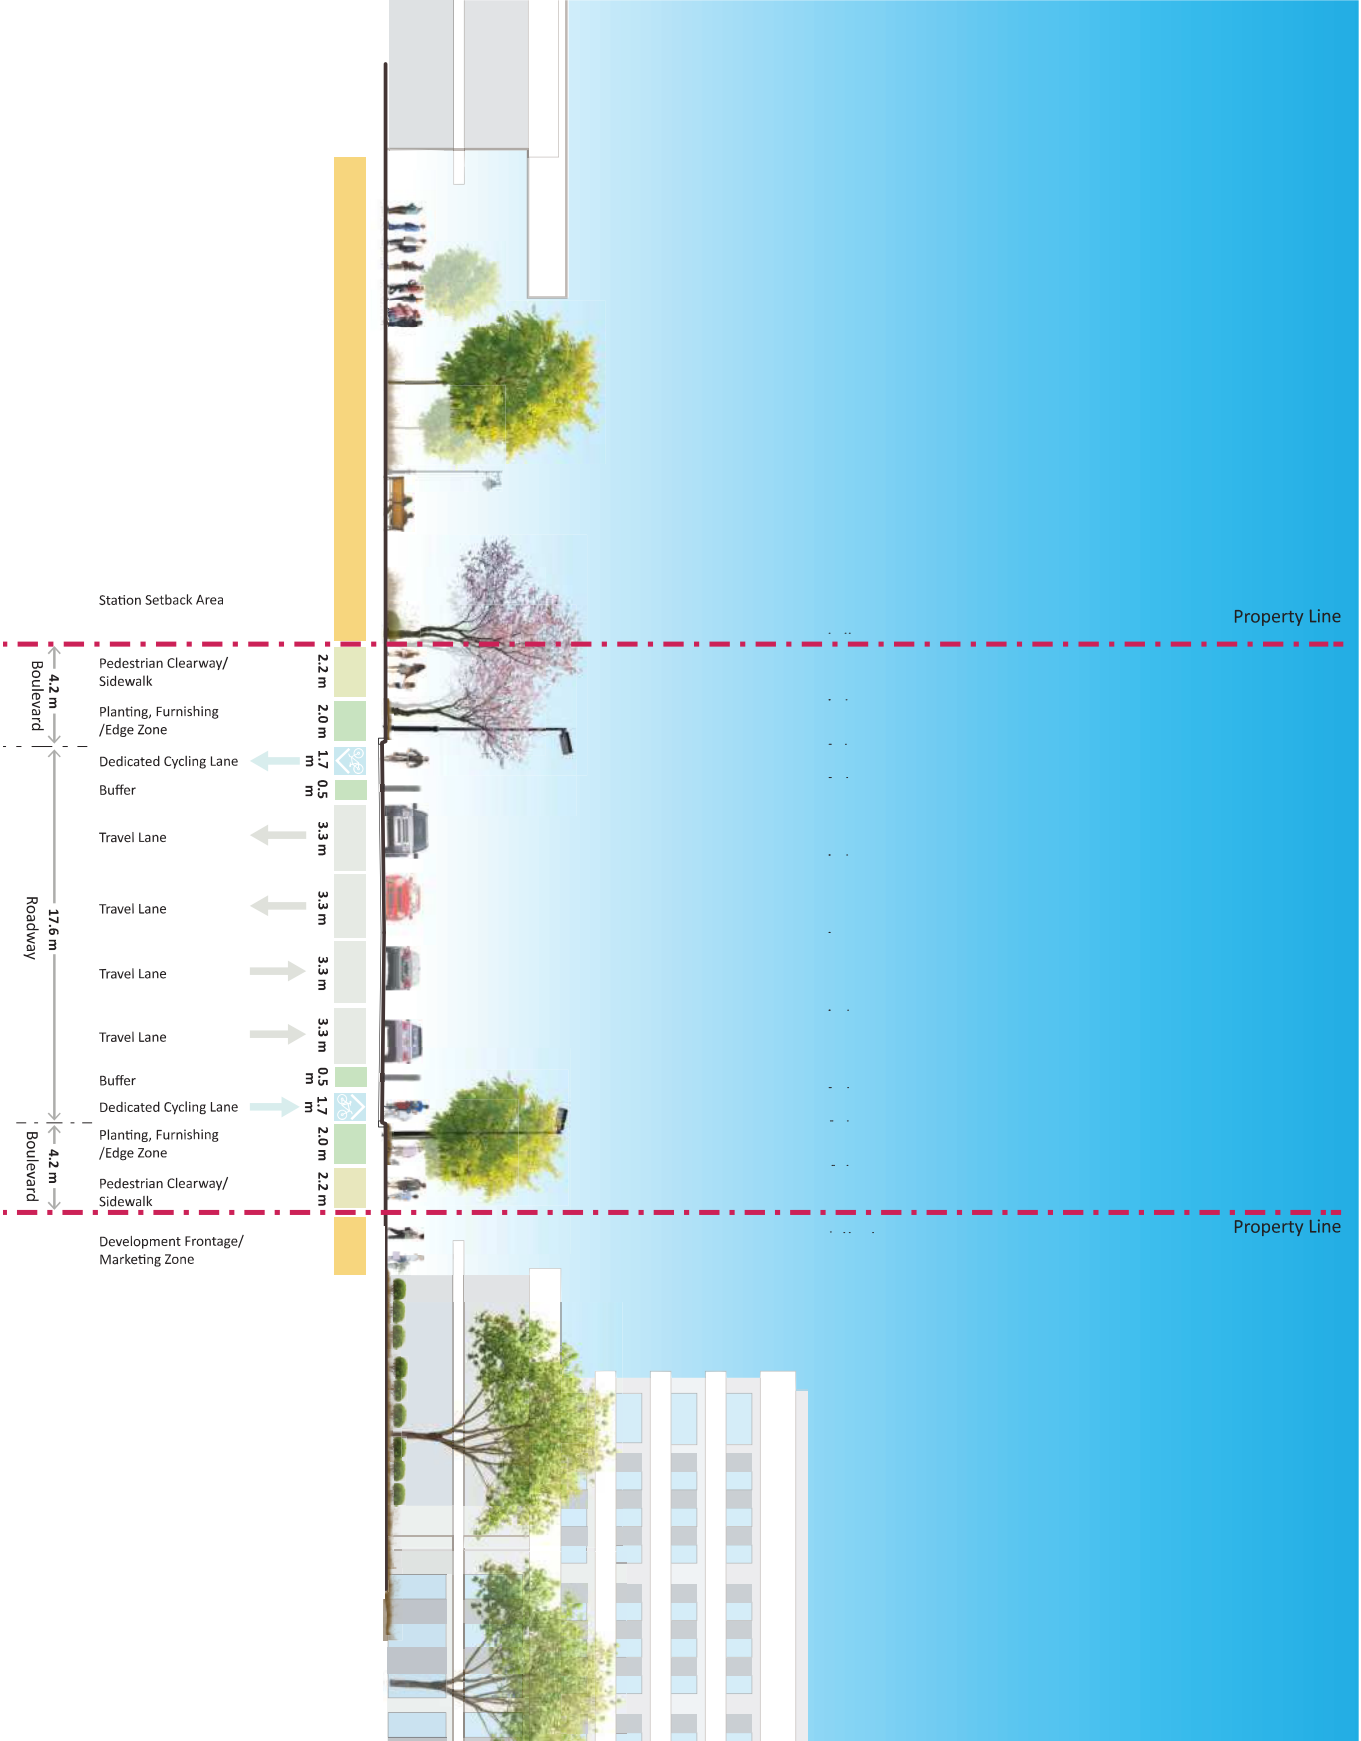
Cross Section - Casablanca Boulevard (Typical Cross Section)
